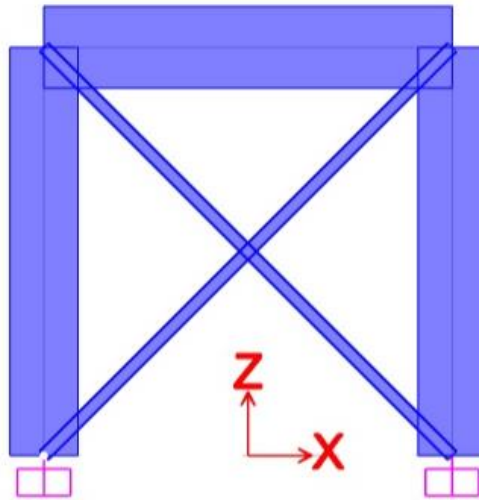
Structural model of the cross bracings-retrofitted frame in X-direction
